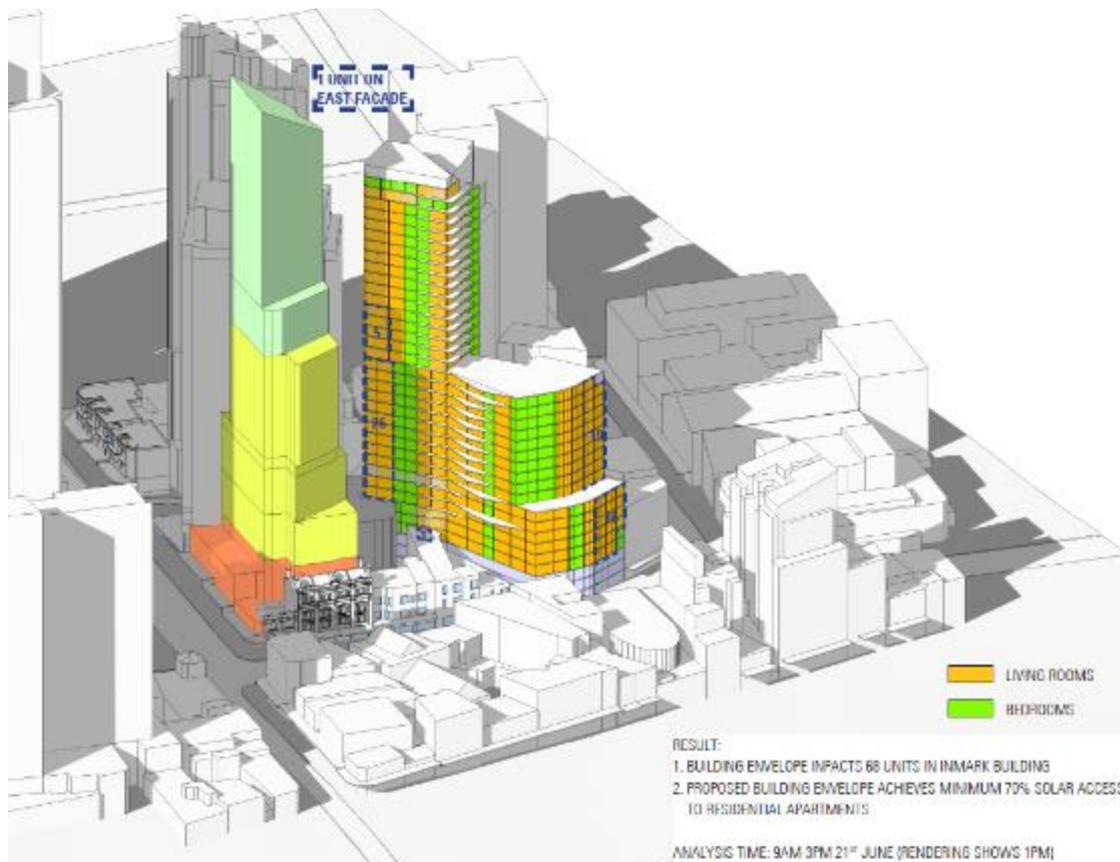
The amended tower envelope required to retain solar access to 70% of apartments within the Inmark
